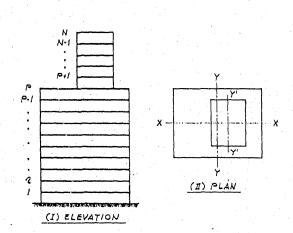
FIGURE G-N-STORY STRUCTURE WITH SETBACK AT PTH STORY
